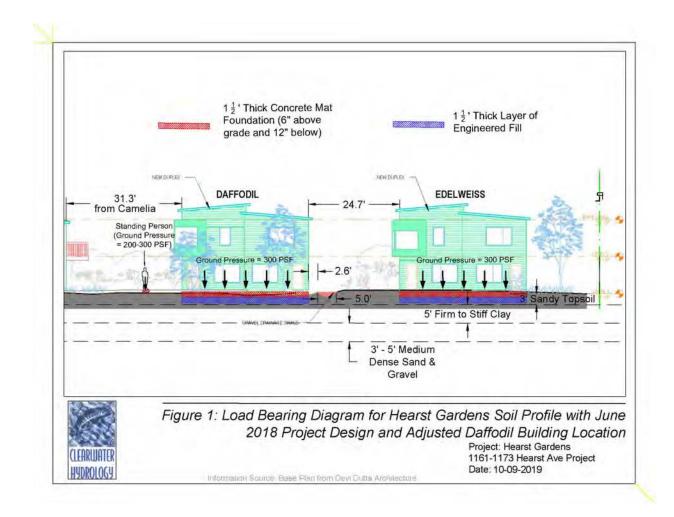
is scaled, and reference to the scale bar shows that the new building foundations do not span the entire site as a single structure, as a dam would. Rather, openings of roughly 15 ft. will exist to either side of these buildings. More importantly, the vertical extents of the engineered fill that would be placed beneath the mat foundations and the overlying mat foundations would not extend to more than 3 ft. below the existing ground. As shown, this depth matches that of the surface soil layer, which is underlain by 3-5 feet of firm clay. Such clay layers are typically considered non-water bearing soil strata and do not readily transmit water vertically, either from the surface via infiltration or from the subsurface via rising groundwater tables.
